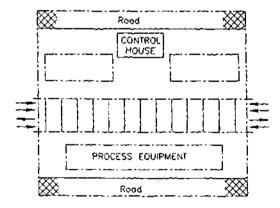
to 2.3.7 shows the typical pipe rack layout for various plant arrangements. Smaller plants have the
